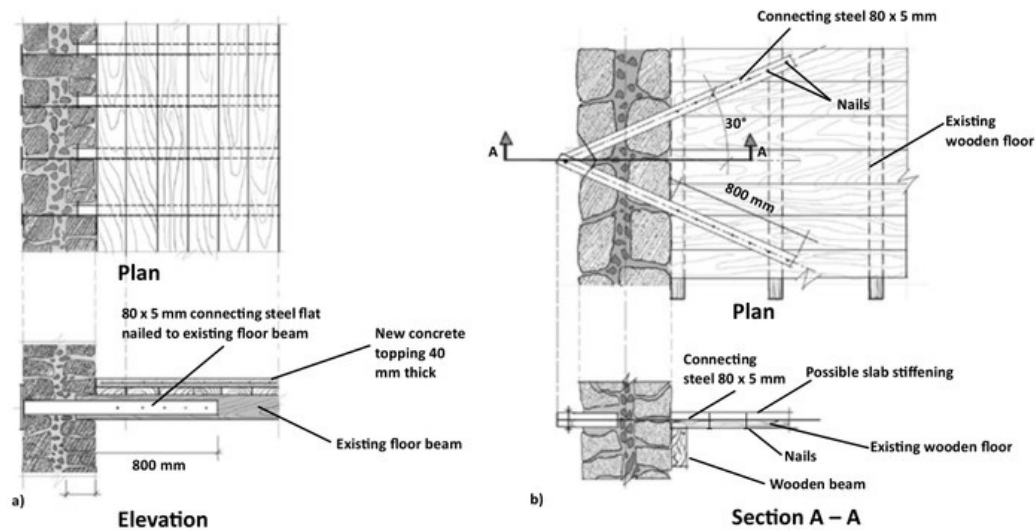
Steel straps for wall-to-floor anchorage: a) floor beams perpendicular to the wall, and b) floor beams parallel to the wall (source: UNIDO 1983)
